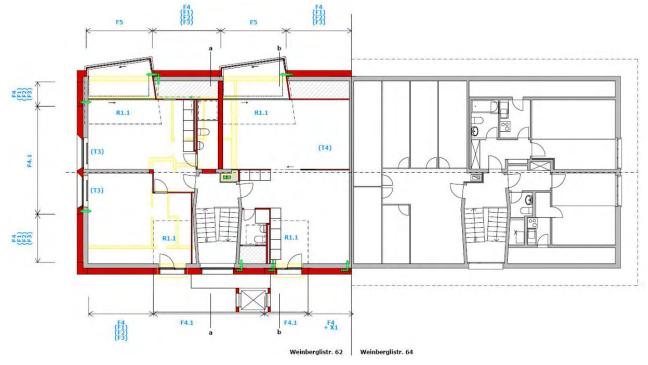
Layout plan of the upper floor (with two ample-sized penthouses)
